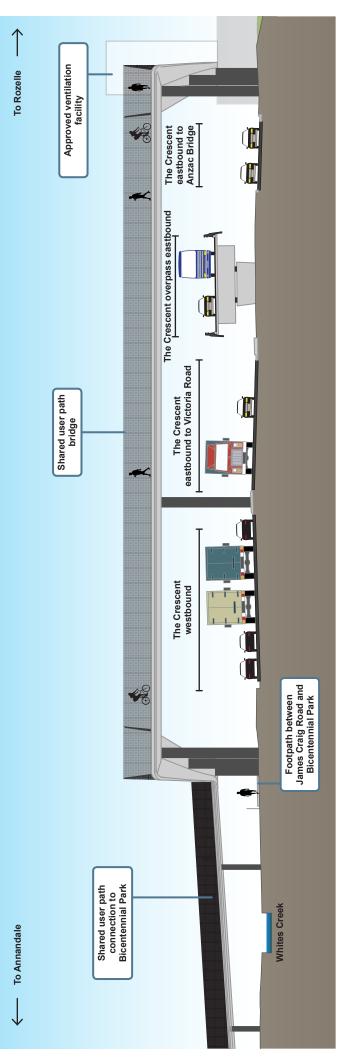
Elevation: Indicative view of the shared user path bridge
